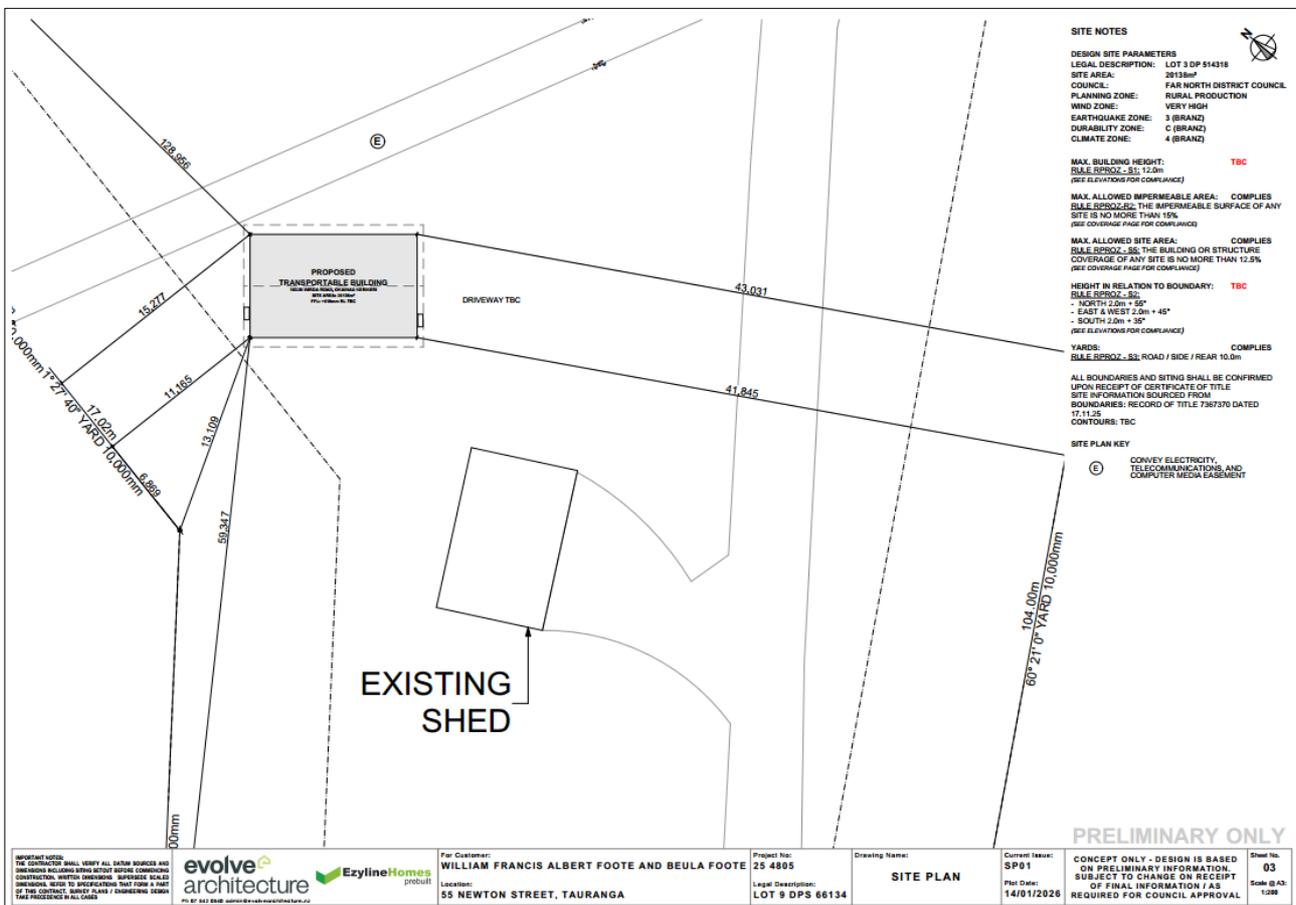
Architectural Site Plan depicting the proposed development (from Evolve Architecture).
